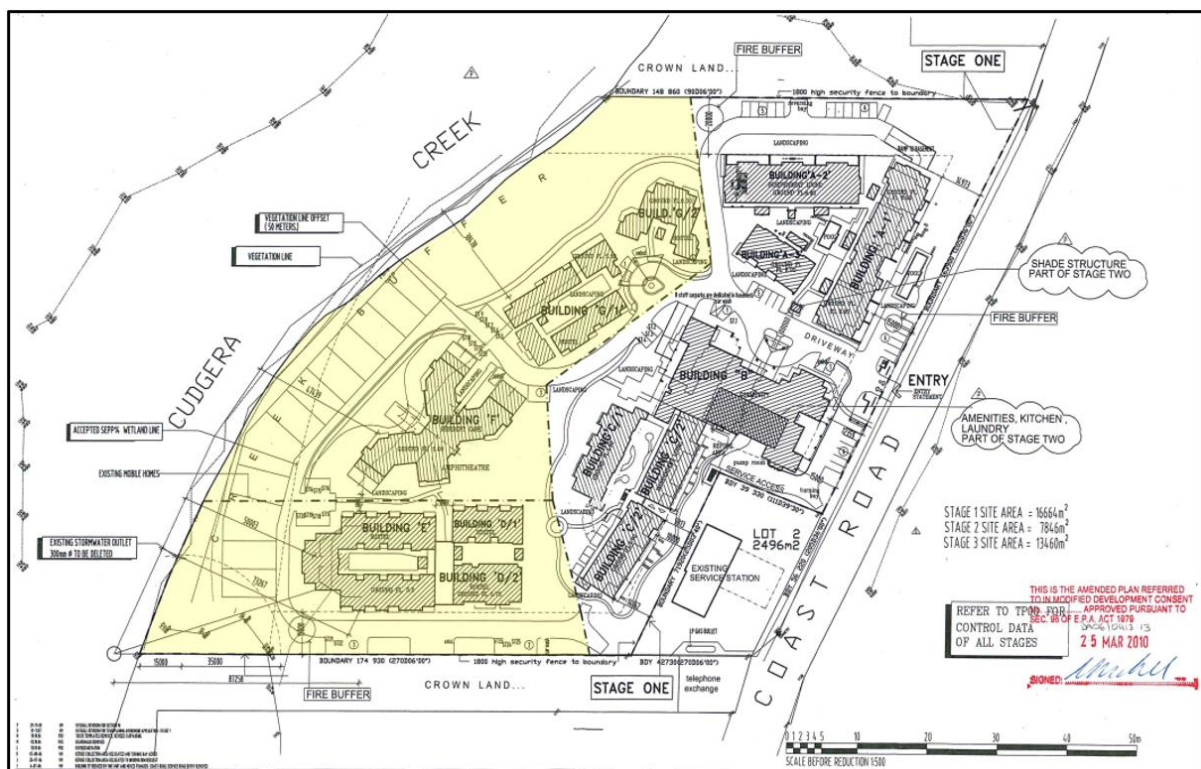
| Approved Site Plan / Alternative Design Option 1
